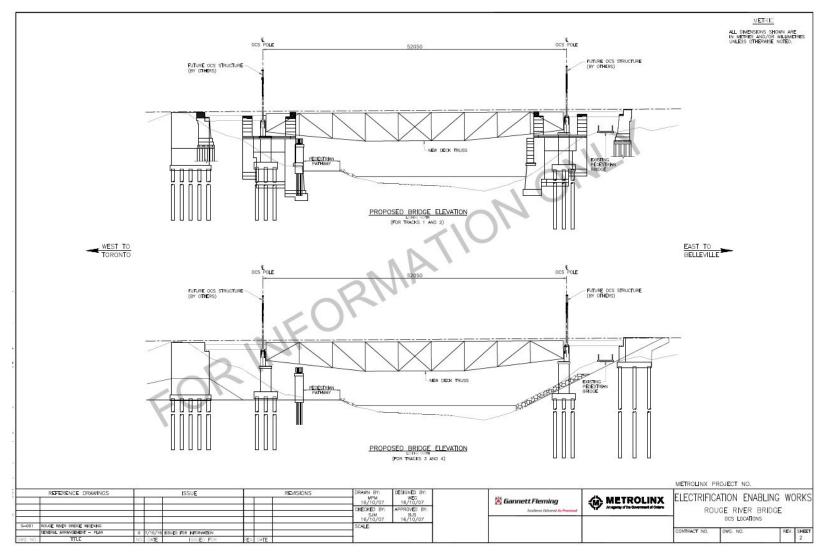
Detailed plan for the OCS Attachment on the Rouge River Bridge. Source: Metrolinx 2017
